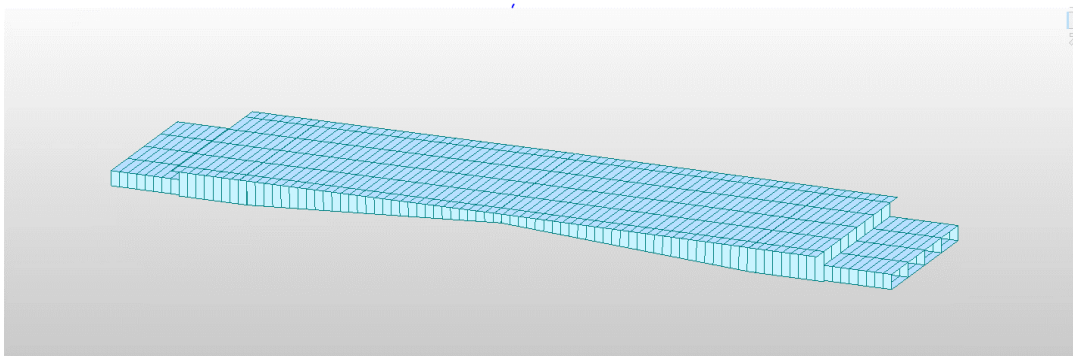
Model of whole bridge in 3D view (Mouchel/WSP, 2017)
